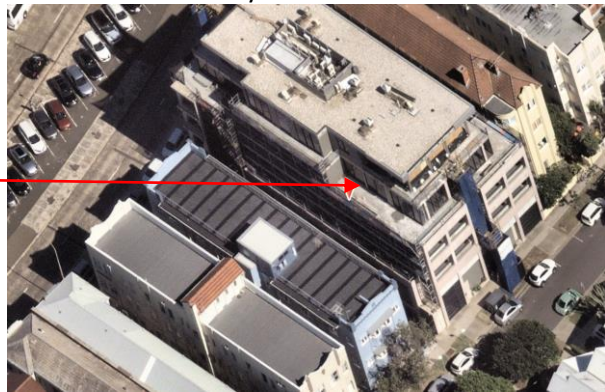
Aerial view of the eastern side elevation of the subject site and the location of the proposed works.
